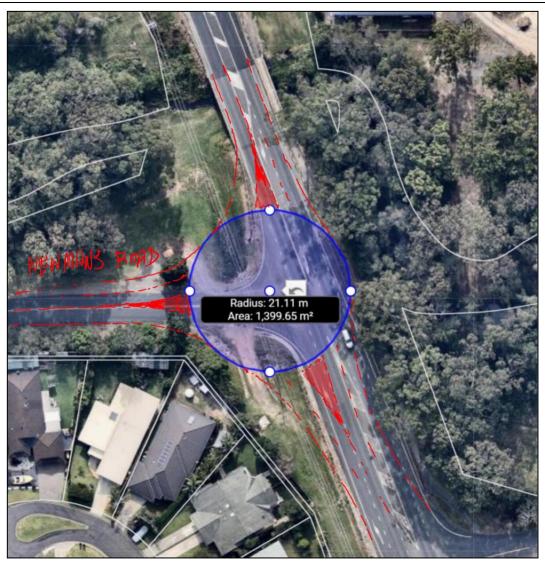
CONCEPT SKETCH OF DOUBLE LANE ROUNDABOUT
